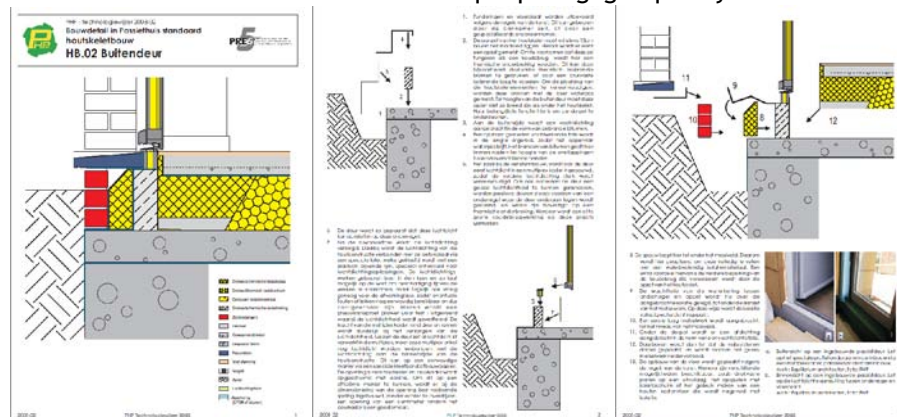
A passive house detail from the Belgian website bouwdetails.be
